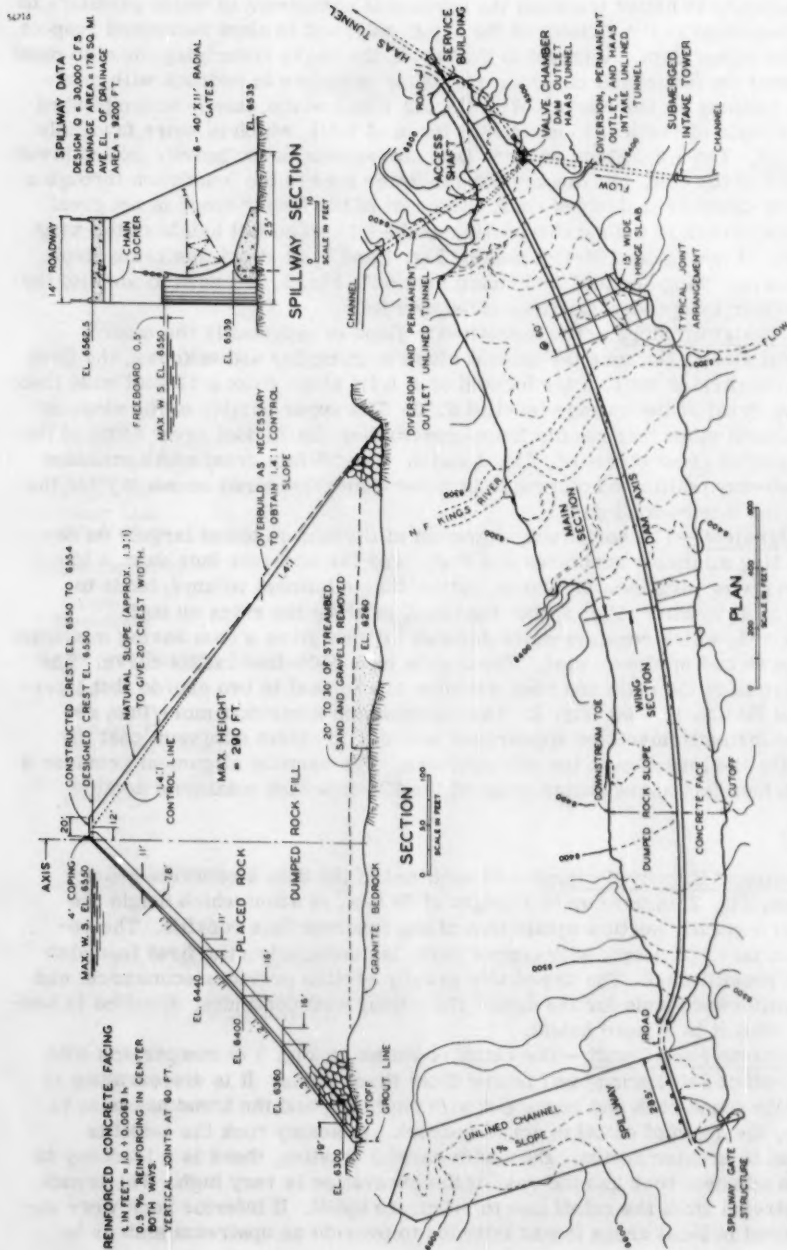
WISHON DAM PLAN, SECTION AND SPILLWAY SECTION
